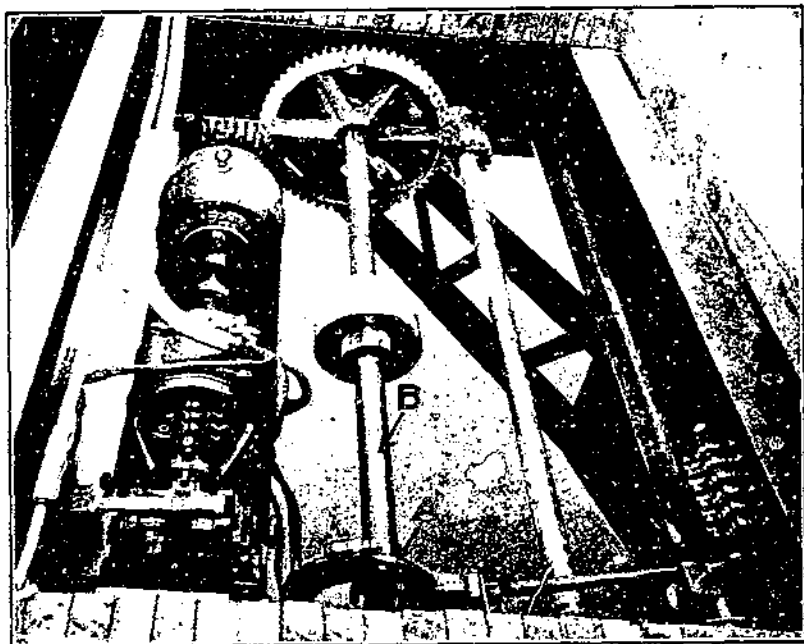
A limit switch for a center-lock motor (double-leaf bascule span). Contacts are made and broken by means of the eccentric, A, keyed to the shaft. B. This eccentric, operating through a system of levers, makes and breaks the contacts at C for control circuits and indicator lights
